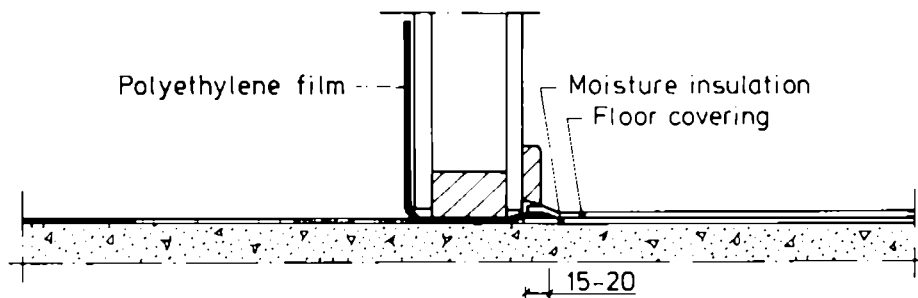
Detail A — Joint between external wall/ground construction (floor at ground level).
